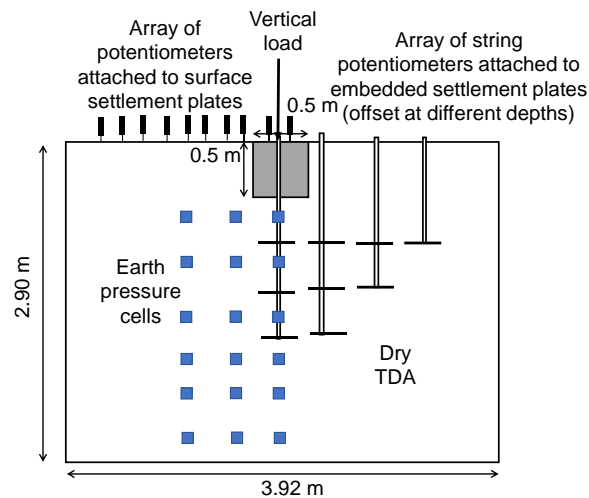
Example of instrumentation layout for vertical loading of footings: Elevation
